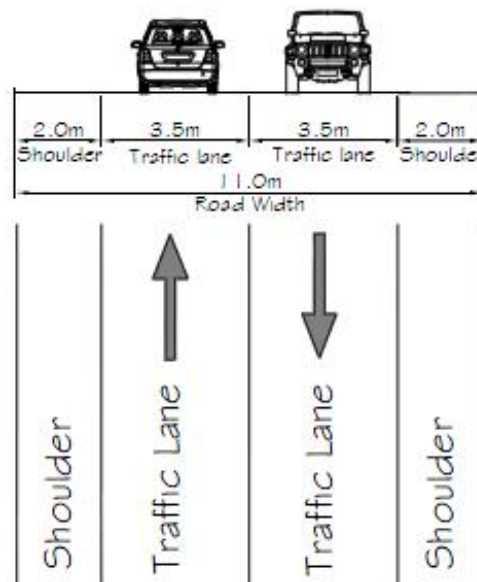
Recommended cross-section for mid-block Western Corridor Port Access road at the intersection
